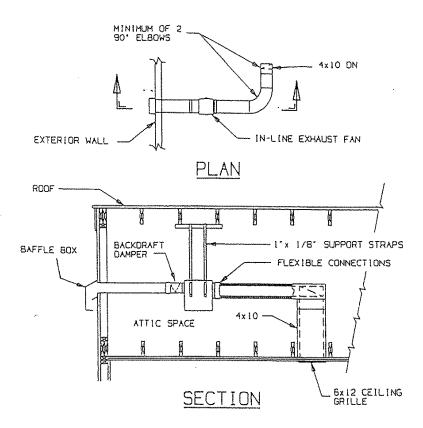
Controlling Noise Entering Through Ducts in Attic Space
